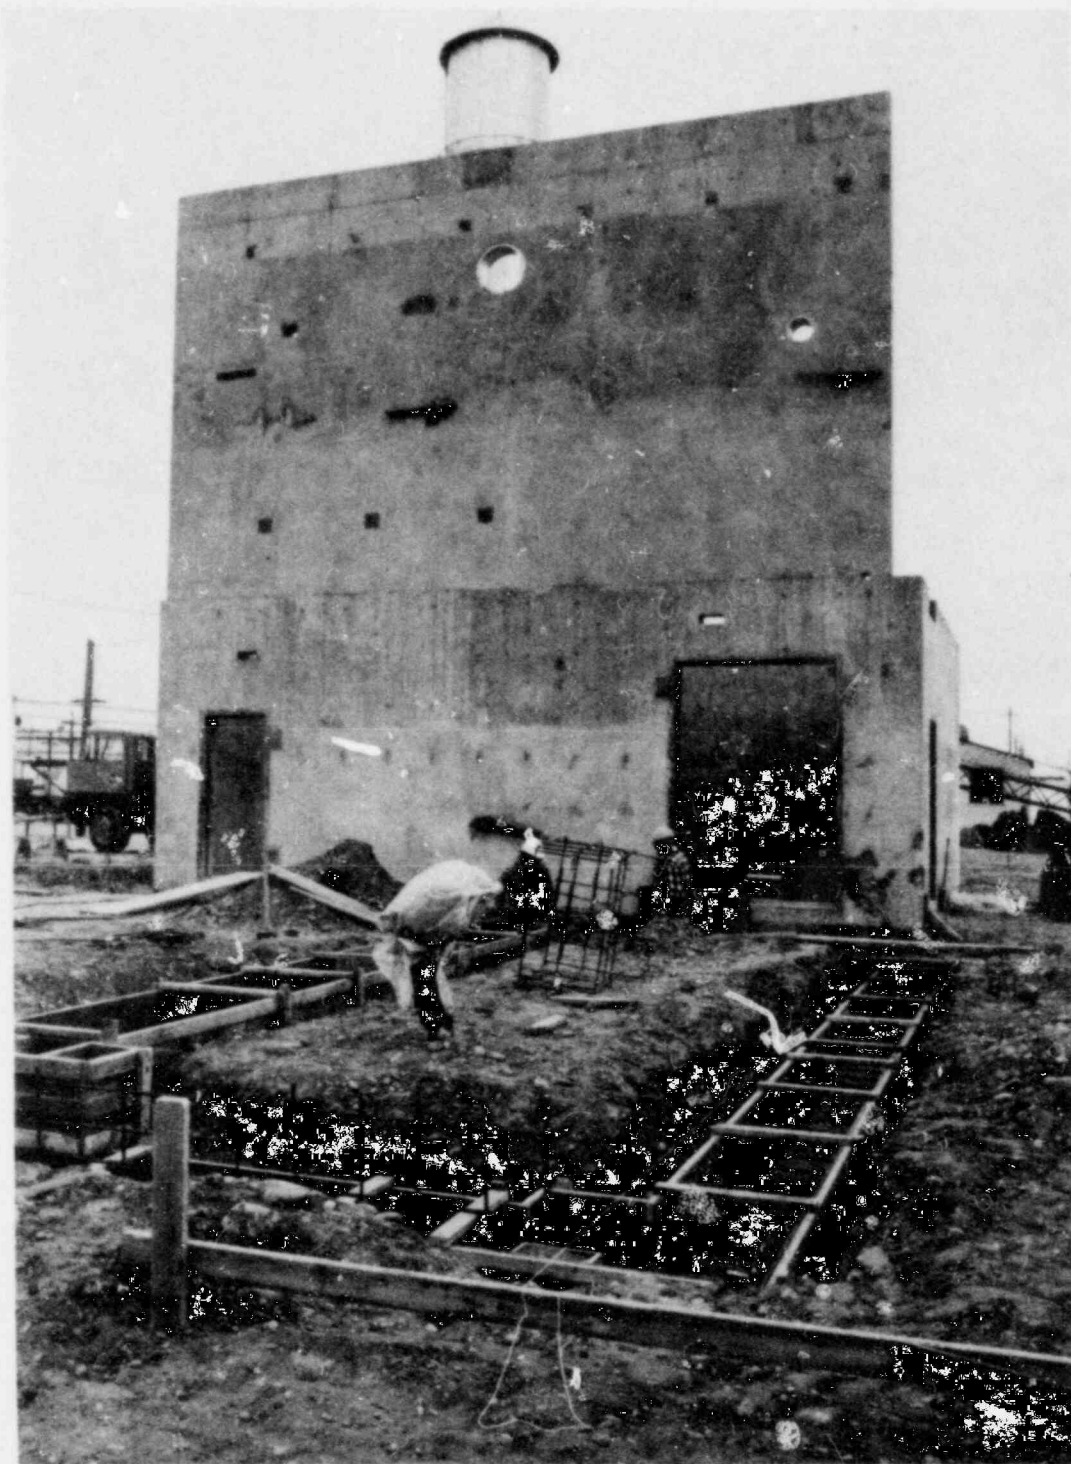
View of Tower Showing Foundation Forms for Support Building Portion of Facility
